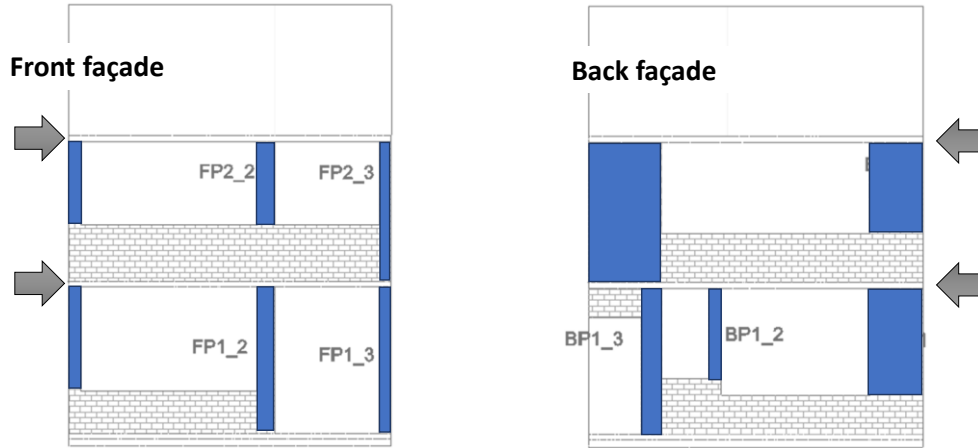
Failure of the piers of the front and back façades for positive loading. The blue colour represents a flexural failure and the green colour a shear failure.
